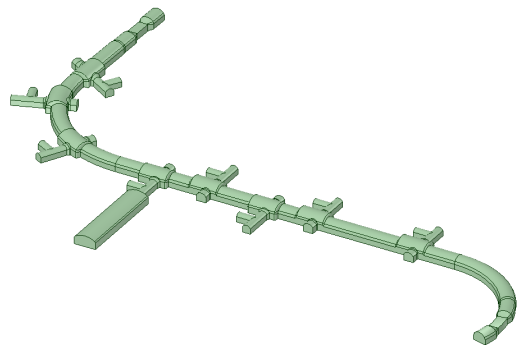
3D modeling for whole tunnel and #4 chamber by using SpaceClaim
